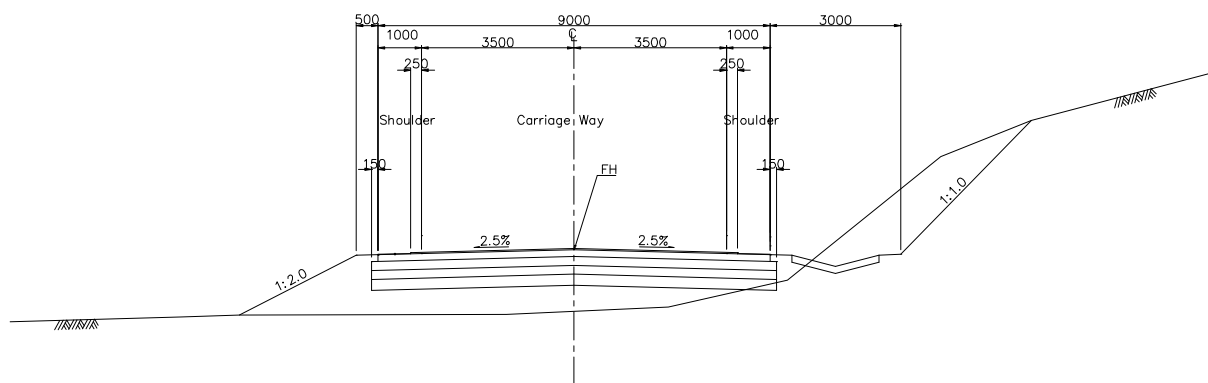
Proposed Typical Cross Section (Unpopulated Area)
